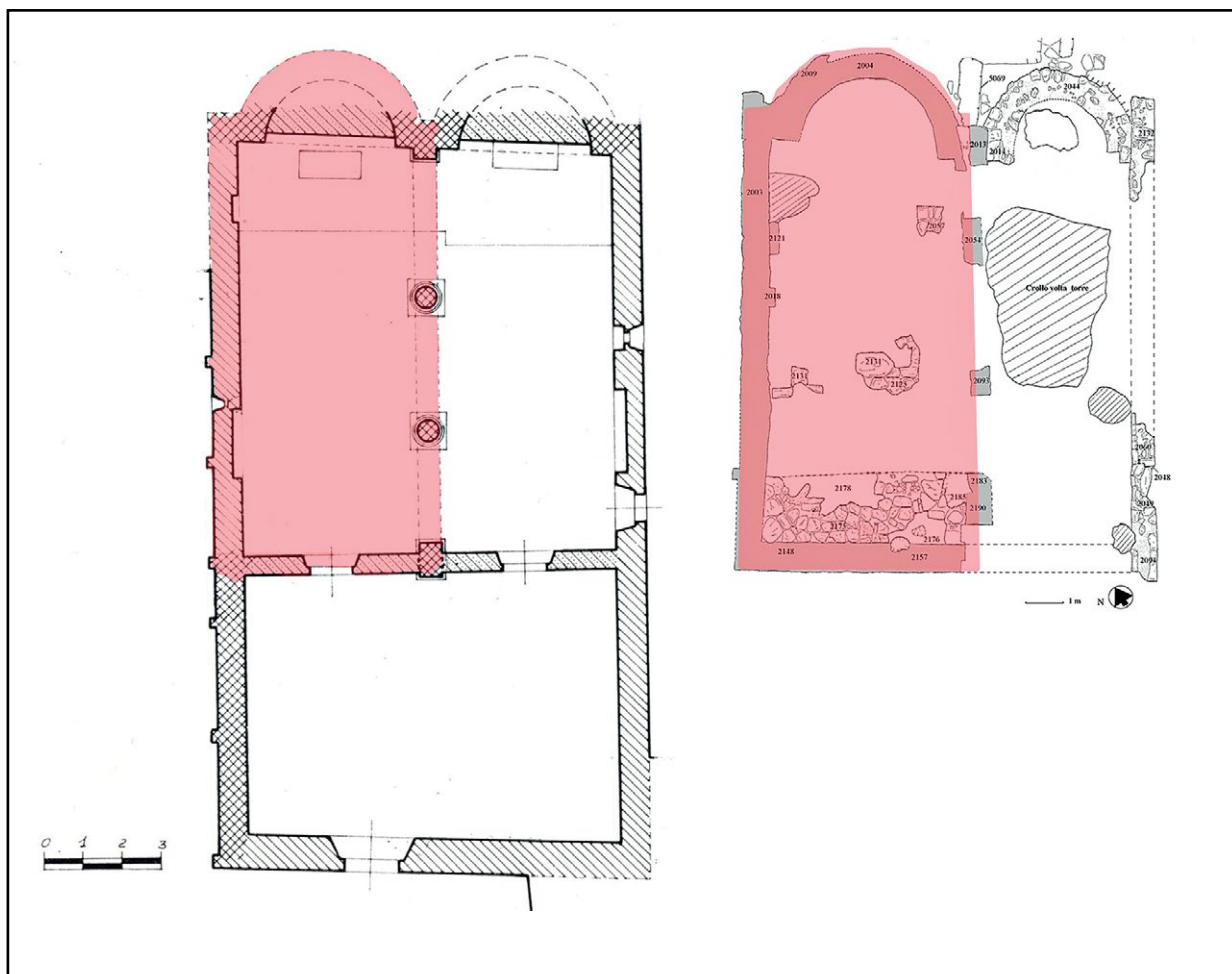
Left: plan of church of S. Piero in Campo showing possible perimeter of the earlier original church (in red) (based on Moretti, Stopani 1972, 43). Right (to same scale): plan of the church with two apses at the site at Torre di Donoratico, showing the older building (in red) consisting of a single nave (based on Notardonato 2004, 35).
